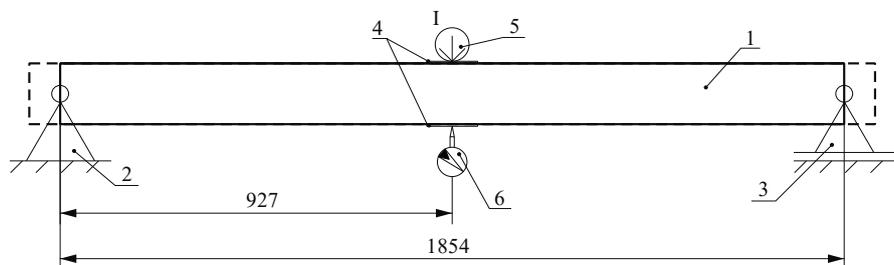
Layout of the test setup elements: 1 – beam; 2 – hinged-fixed support; 3 – hinged-movable support; 4 – distribution plate; 5 – pendulum “payload”; 6 – digital sensor
